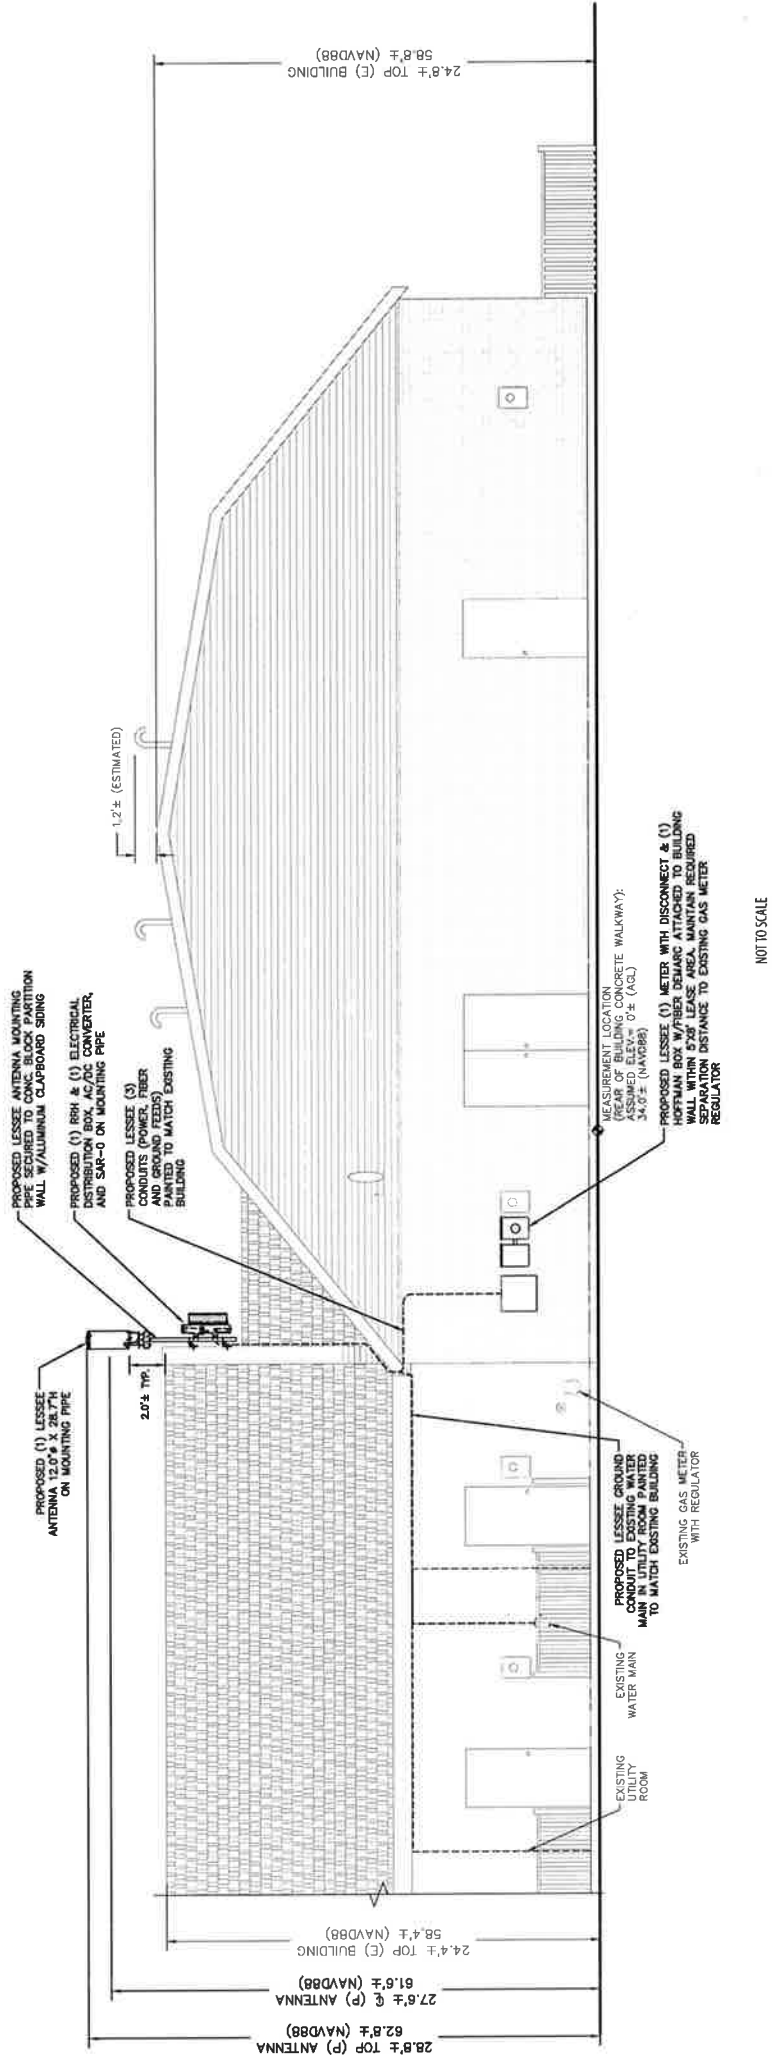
PROPOSED EQUIPMENT LOCATION AND ELEVATION PLAN
